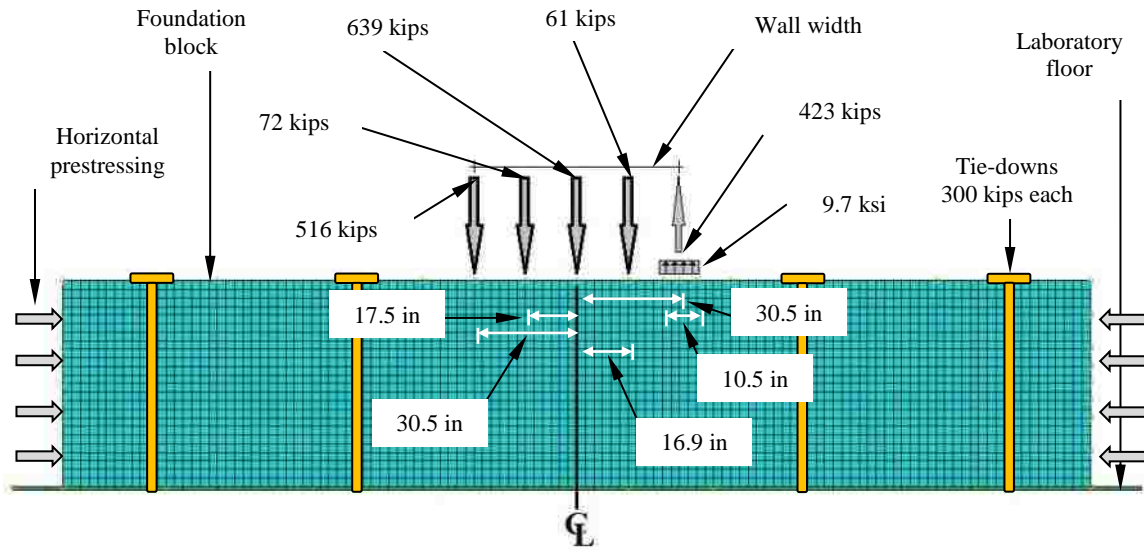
Forces transferred from the test wall to the foundation block and horizontal prestressing forces
